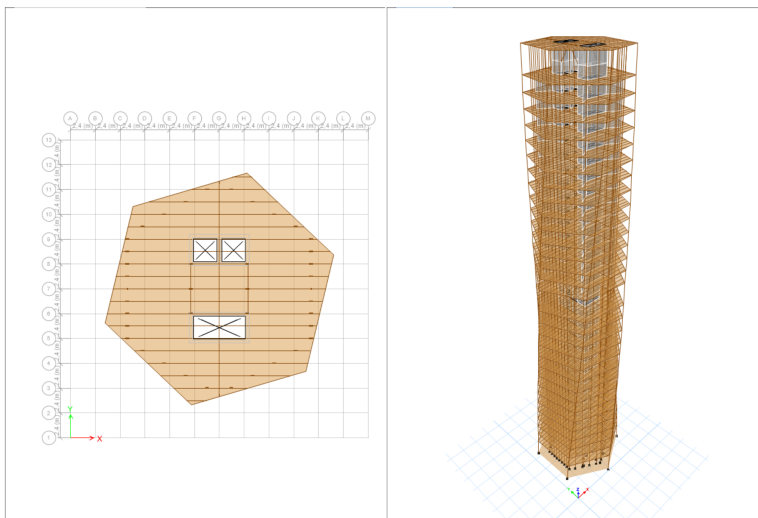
Plan section and 3D view of hexagonal twisting and tapered
